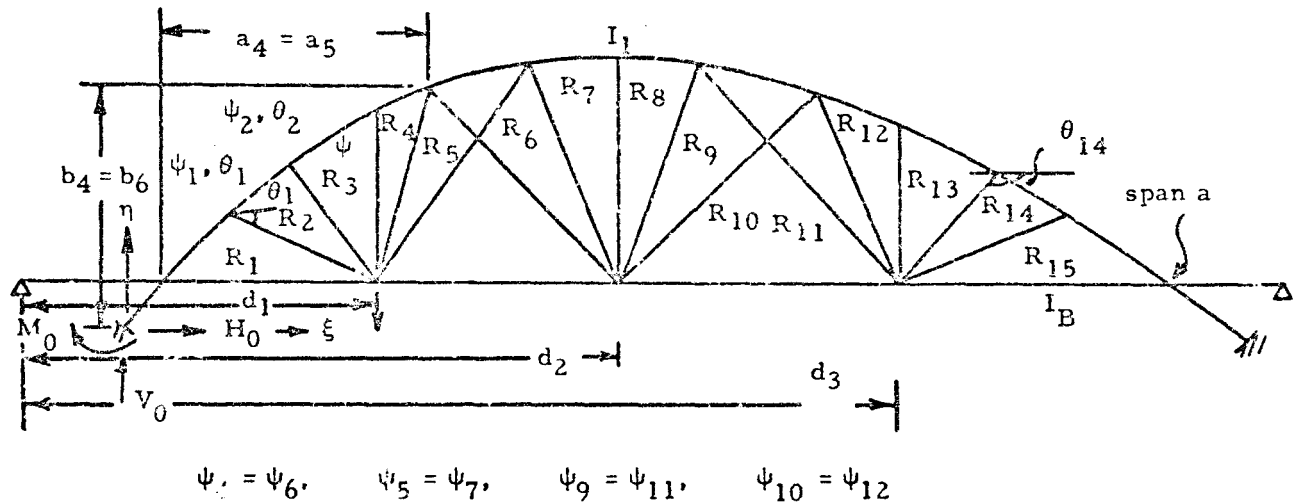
LEANING ARCHES BRIDGE, ELEVATION VIEW
